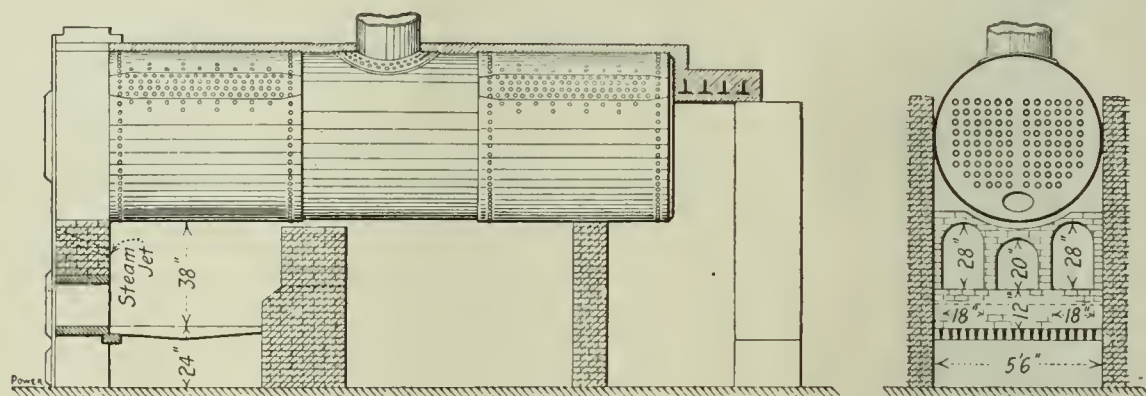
BOILER AND SETTING, SHOWING ARCHED BRIDGEWALL
